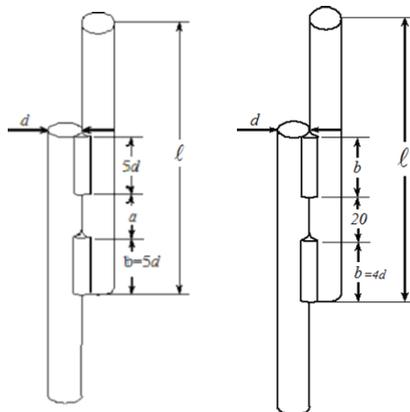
Schematic of welded lap joint of reinforcing steel specimens
